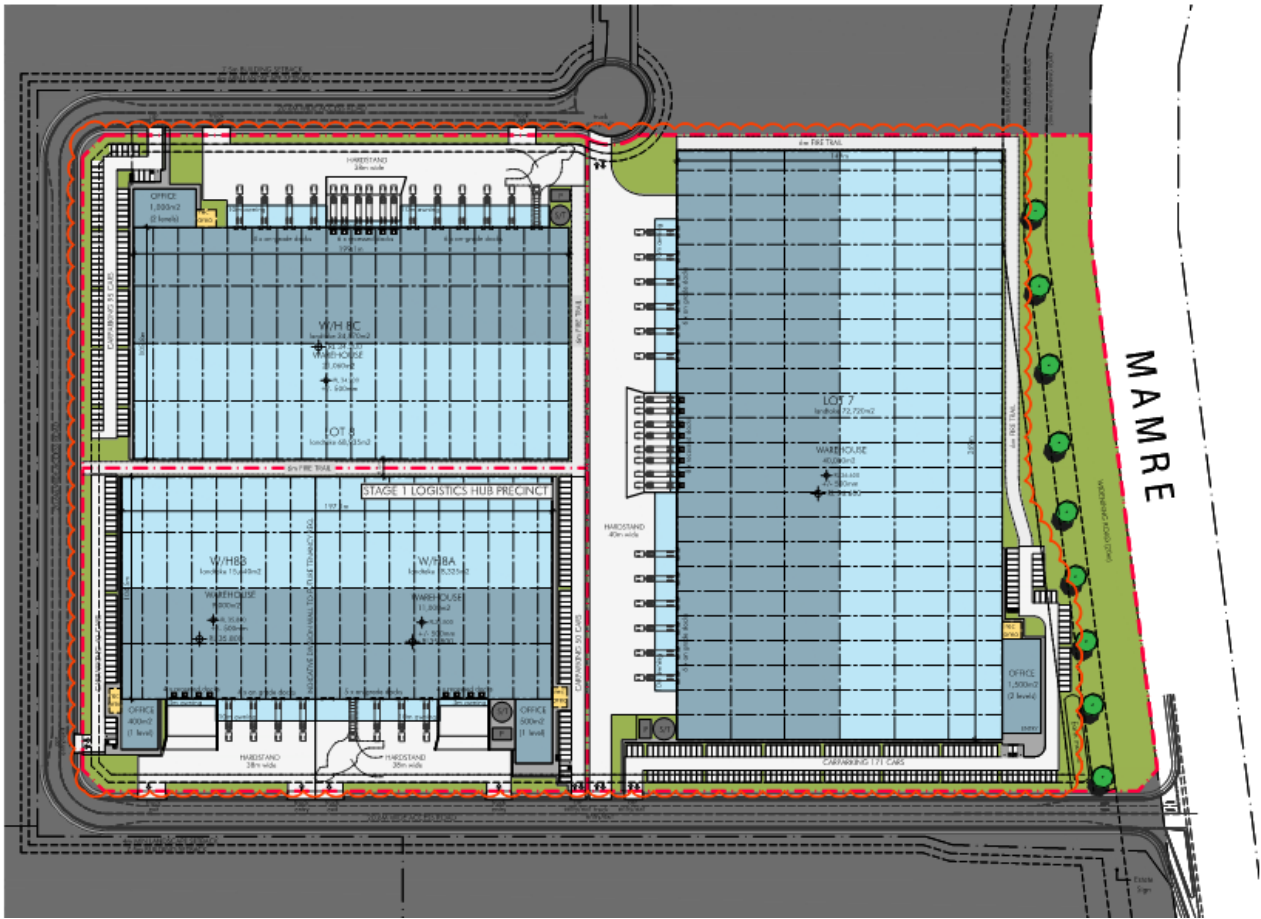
Approved Layout – Lot 8A, 8B and 8C
